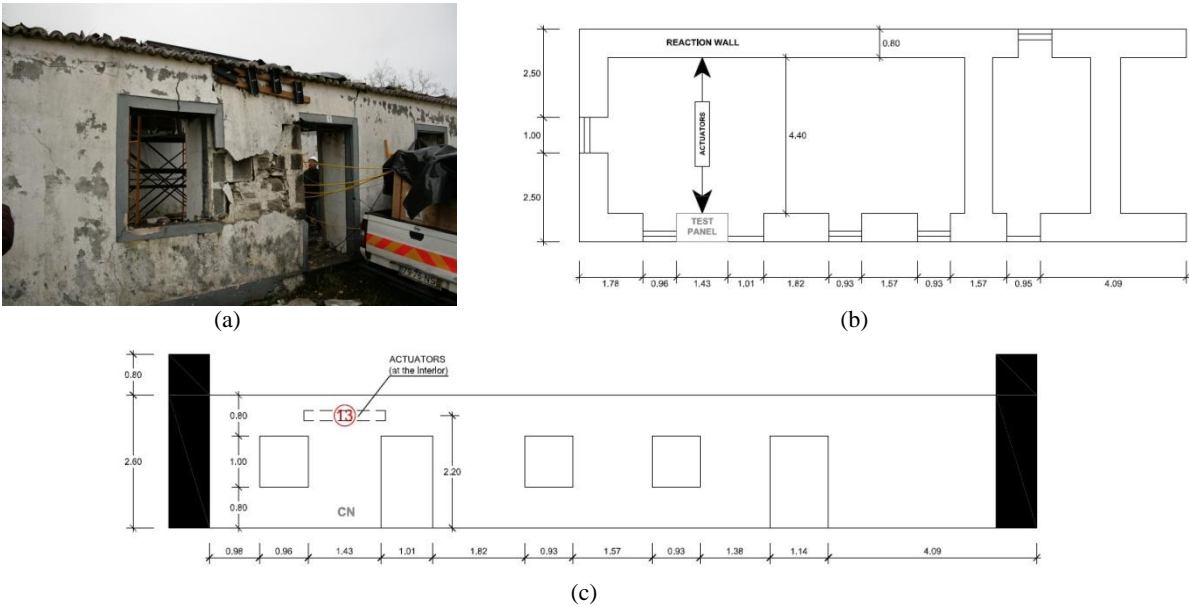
Test #3: (a) main façade picture; (b) plan view; and (c) main façade
